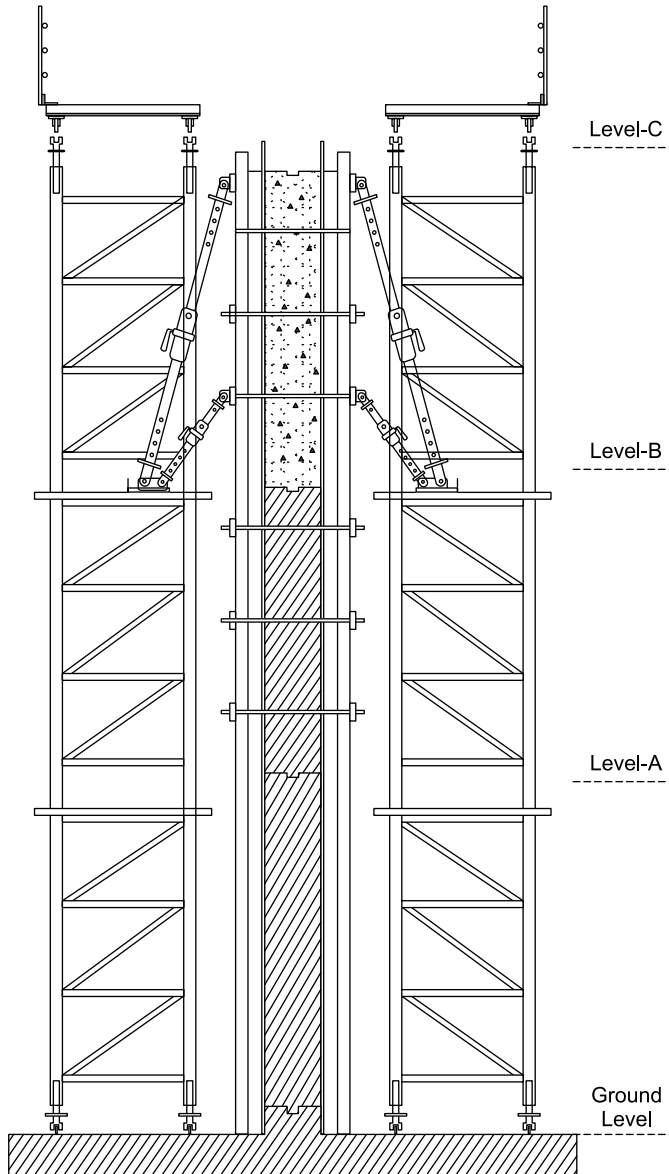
(c) Step 3 of Wall Formwork— Casting of 3rd Lift.
